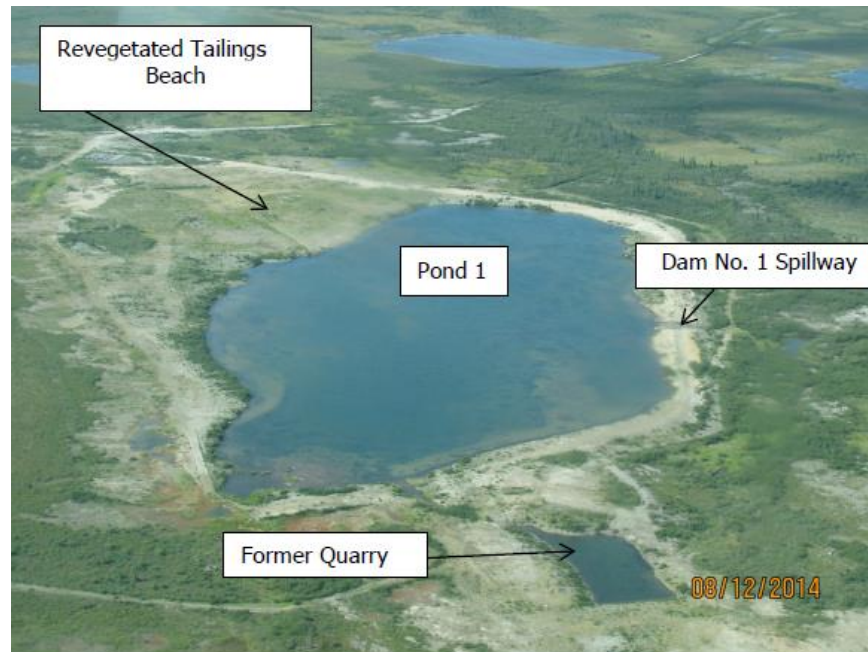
Tailings facility looking north [Reference: EXP 2014 annual geotechnical inspection report]
